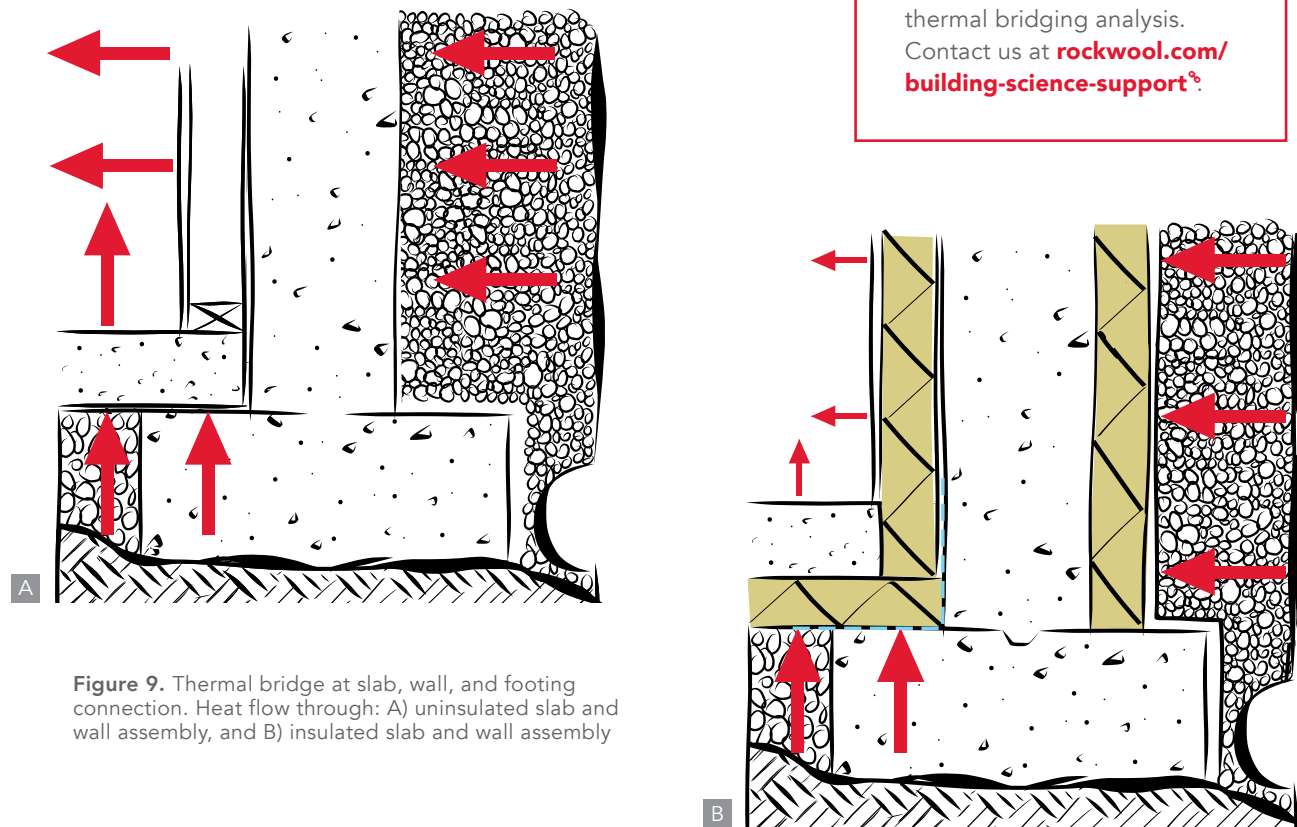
Thermal bridge at slab, wall, and footing connection. Heat flow through: A) uninsulated slab and wall assembly, and B) insulated slab and wall assembly
